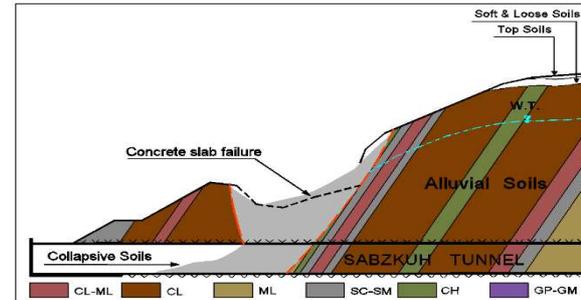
Tunnel collapsing and the failure of concrete slab [7].
